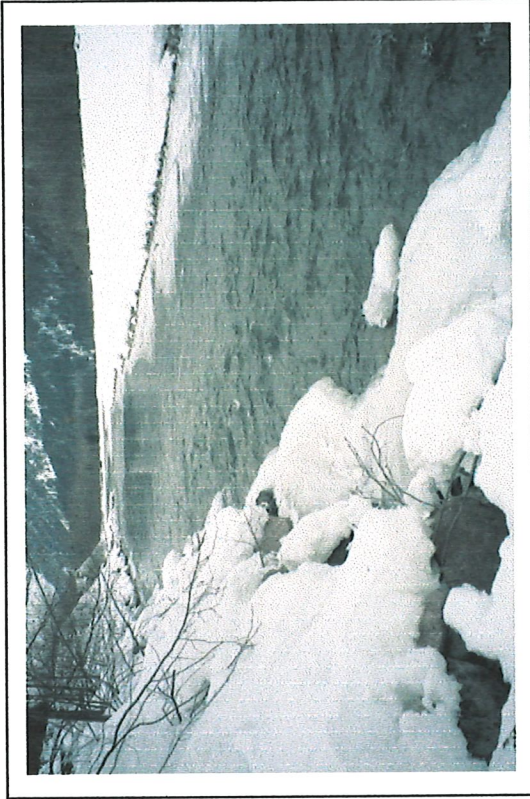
Looking downstream from the confluence of the outlet channel at additional bank protection installed as part of this project. Photo point 1.
